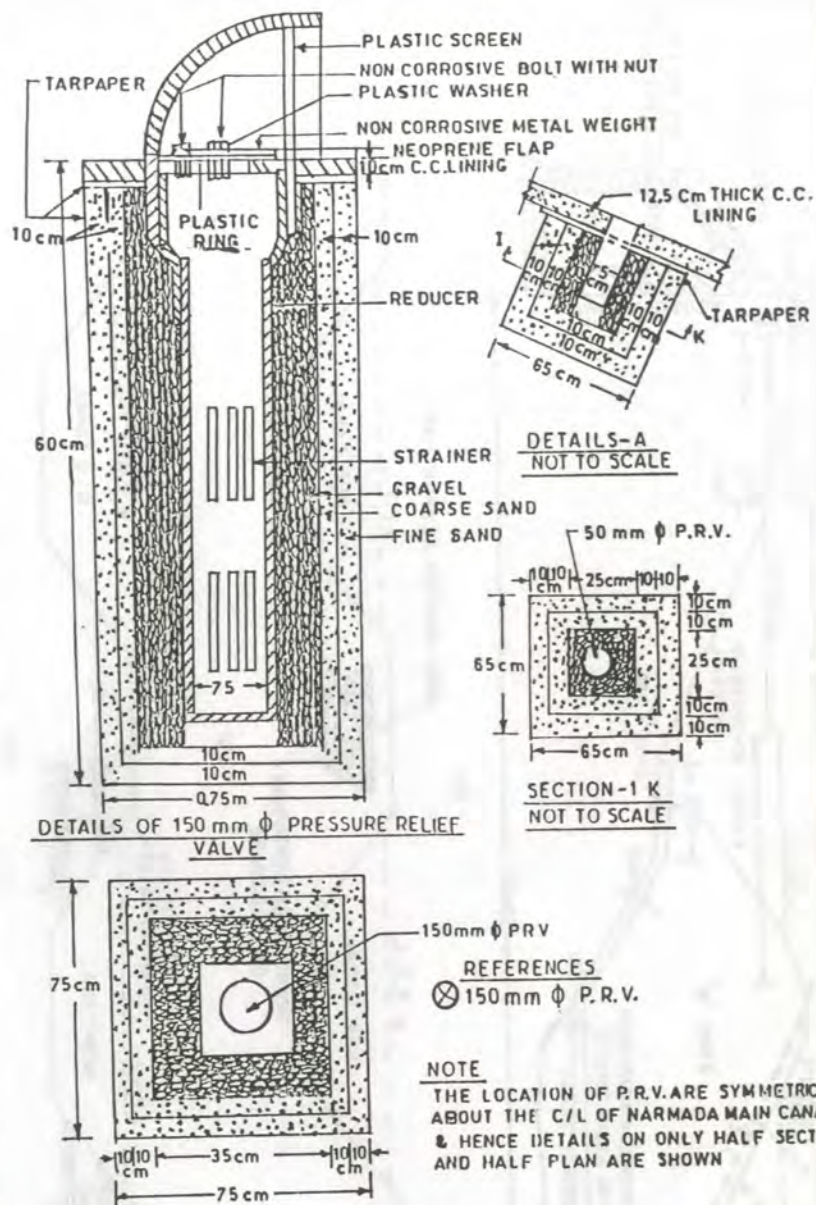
(b); DETAILS OF UNDER DRAINAGE ARRANGEMENT BELOW CANAL LINING
